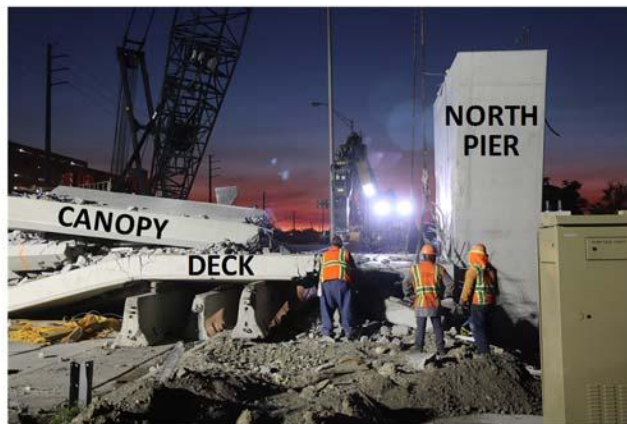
Photos looking west showing jackhammering and removal via crane of the large deck piece.
